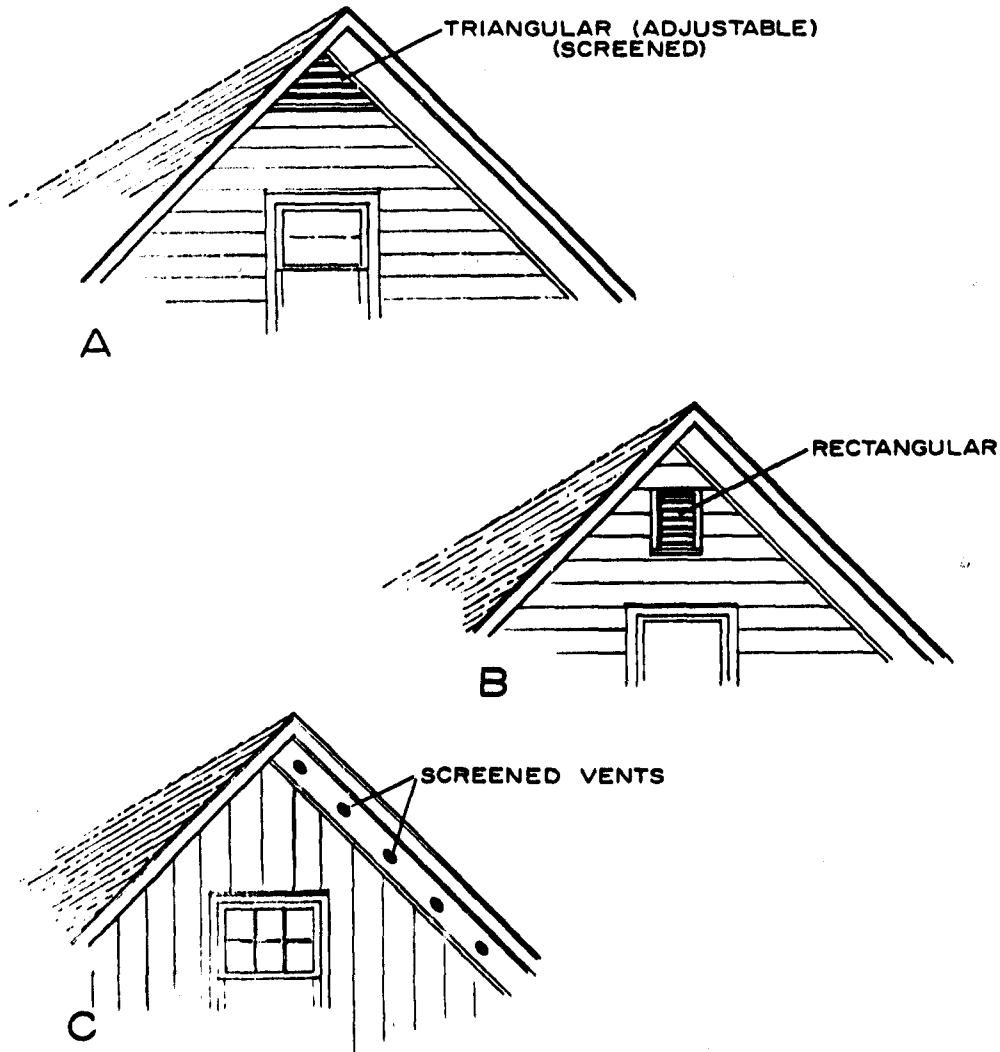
Gable outlet ventilators: A, Triangular gable end ventilator; B, rectangular gable end ventilator; C soffit ventilators. M 139 228
